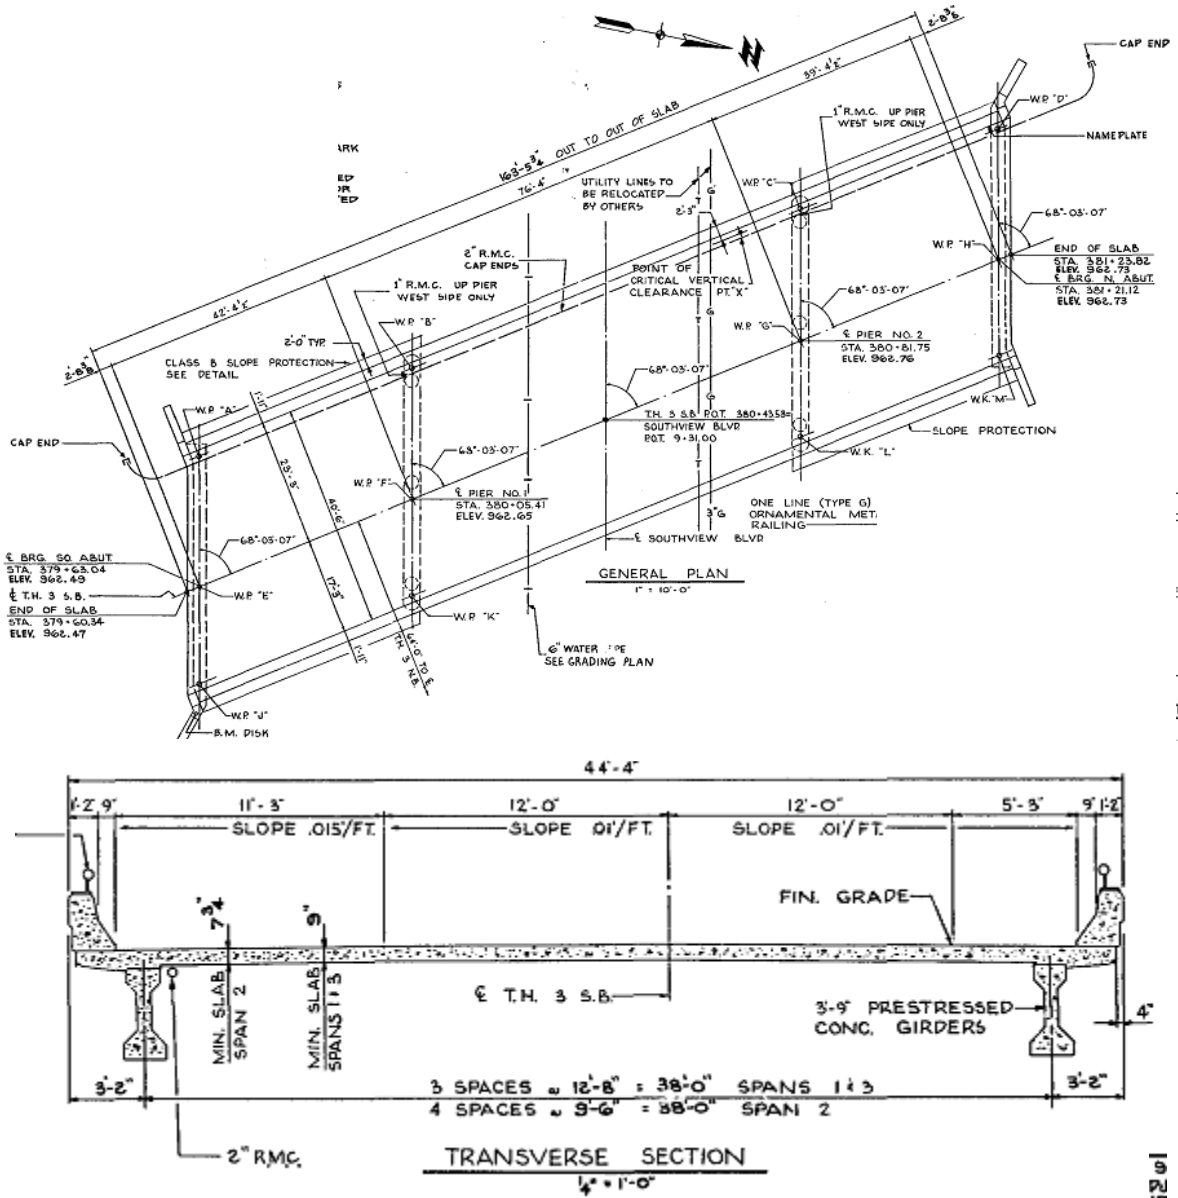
Plan view (above) and cross section (below), bridge 19015.
